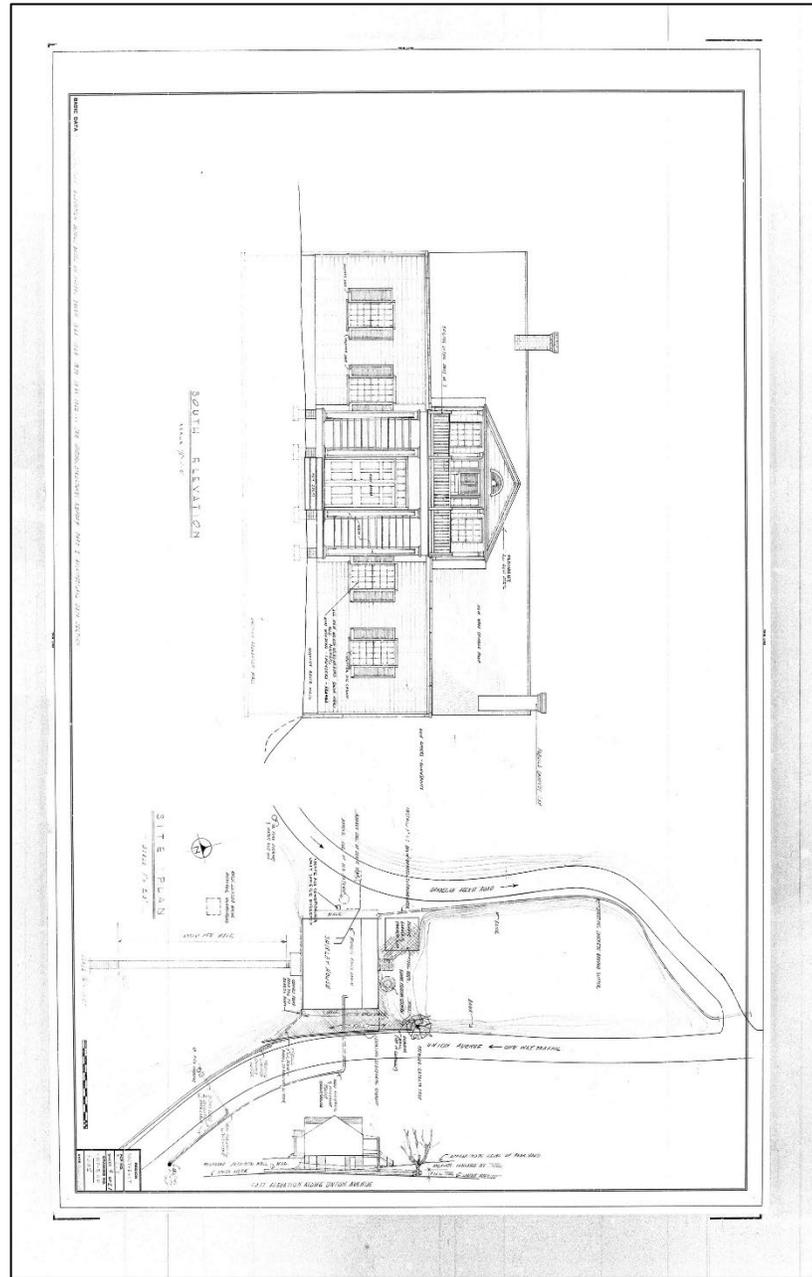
Restoration plans, site plan drawing, October 1965. Source: National Park Service, drawing no. NMP-VIC-3082, sheet 3.
